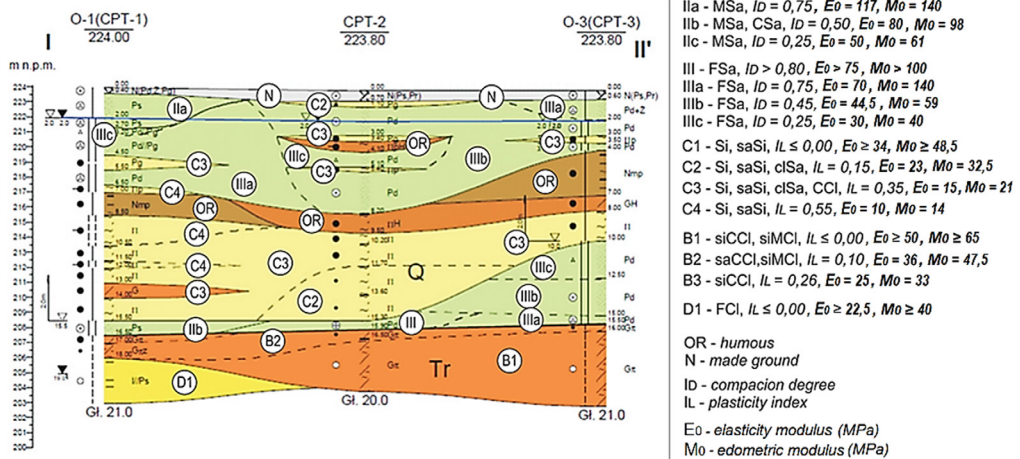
Geotechnical cross section (author: Ł. Pietrusa, 2011)
